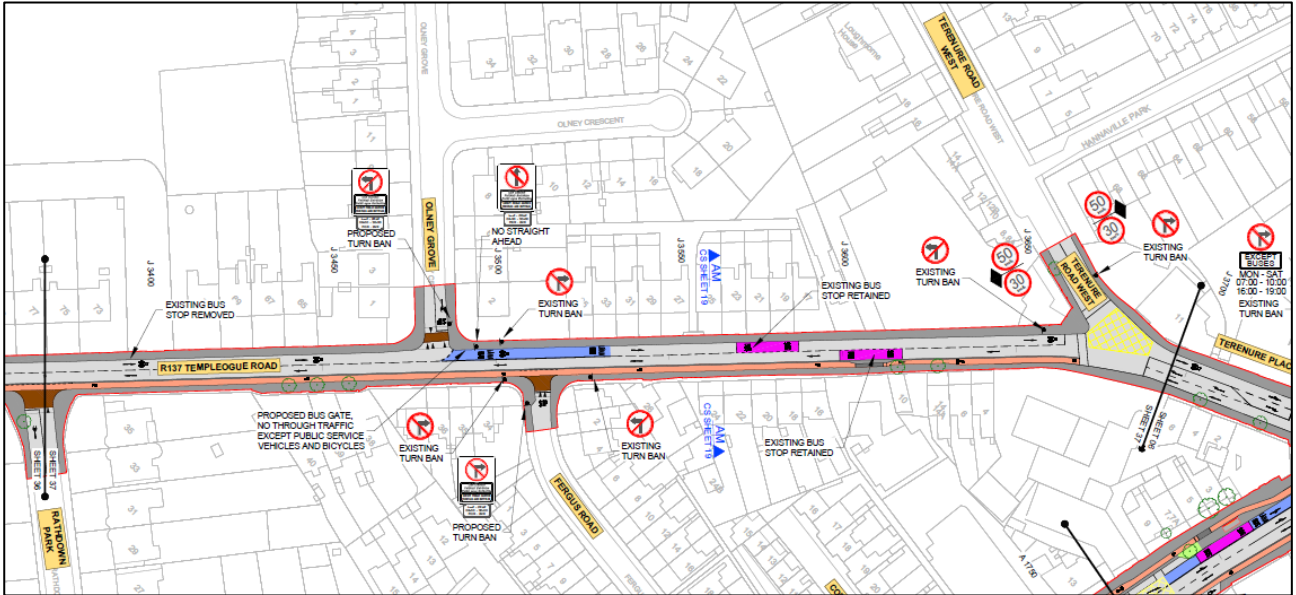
Extract from General Arrangement Drawings (Sheet 37)
